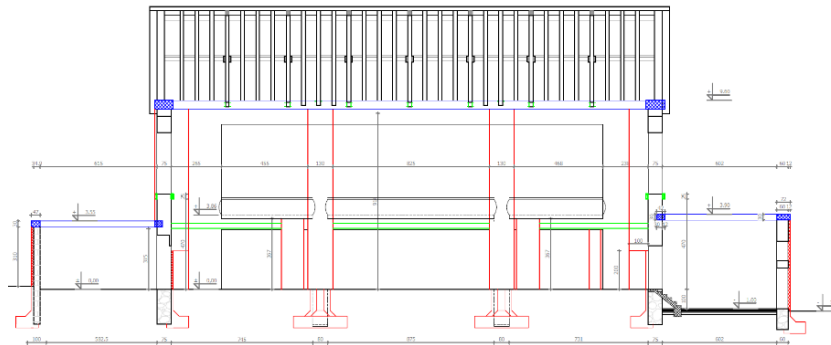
Characteristic cross section for the proposed strengthening solution: longitudinal cross section
